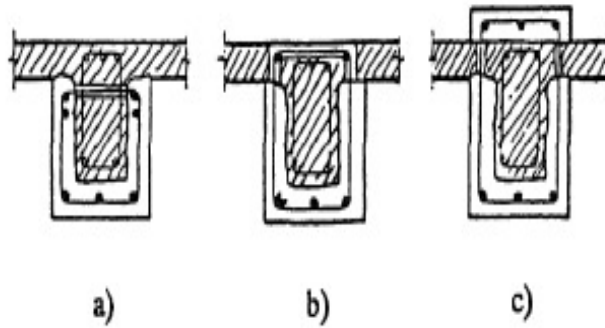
Three - Four - Sided Jacketing (beam)
